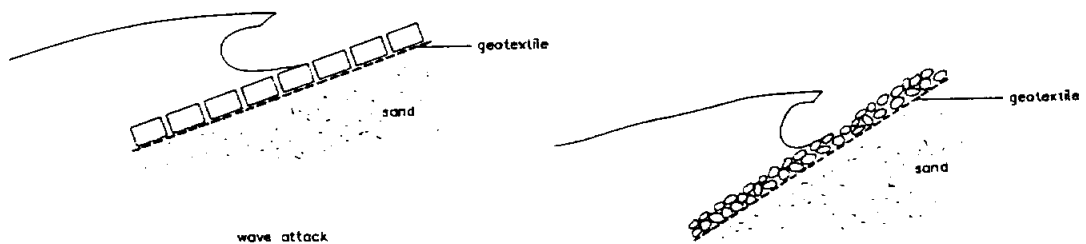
Examples of structures in which geometrically sandtight geotextiles are necessary
